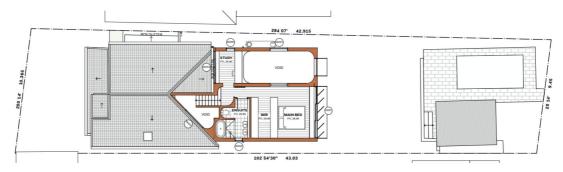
Proposed first floor plan (Carter Williamson Architects)
